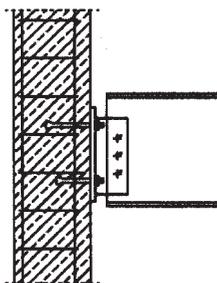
Steel beam connected to concrete wall with anchor plate and shear tab.
